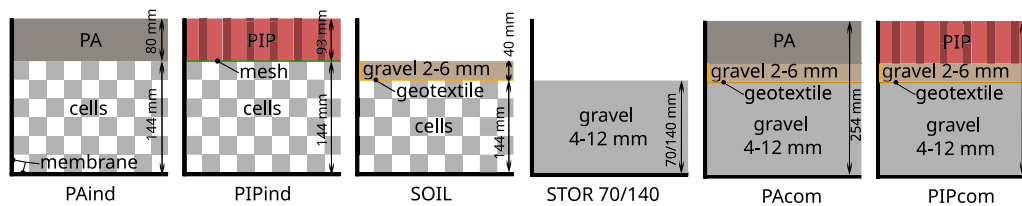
Tested cross-sections, the first four for individual layers (PAind, PIPind, SOIL and STOR70/140), and the last two for complete layouts (PAcom and PIPcom).
